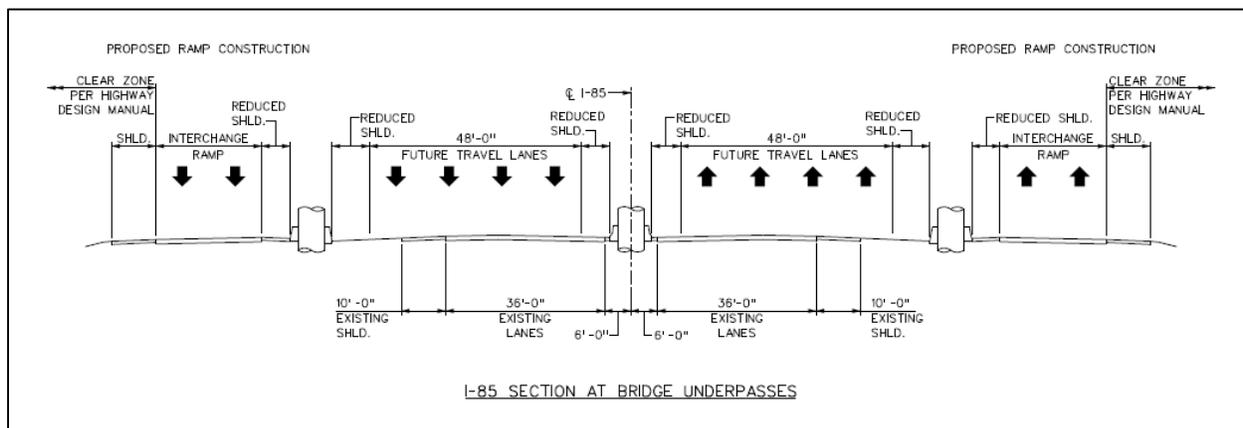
I-85 Future Typical Section at Bridge Underpasses
